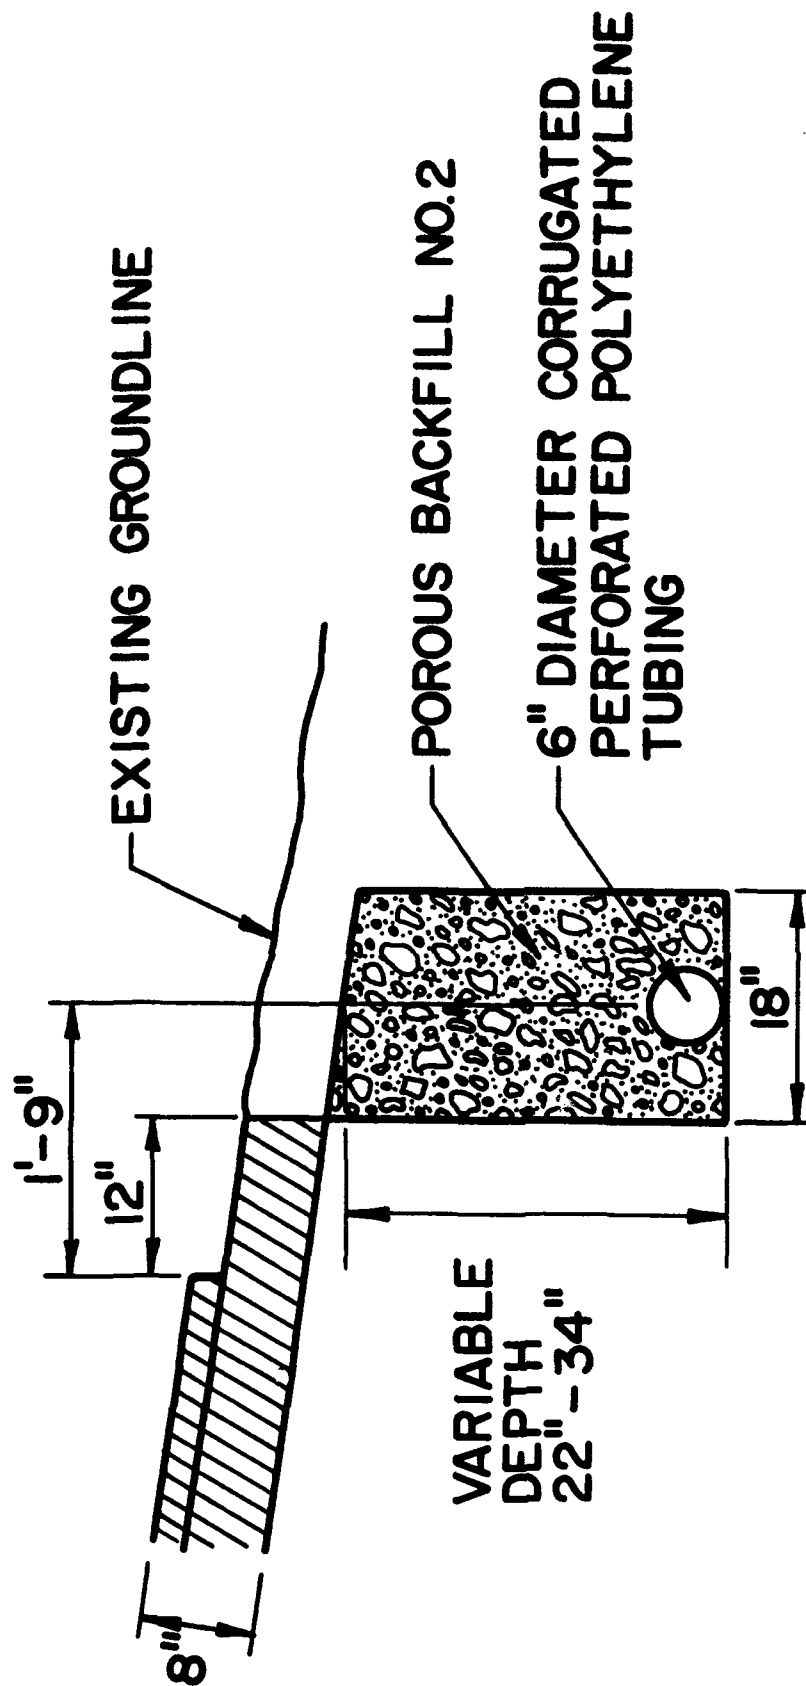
Installation Details for 6 in. Diameter Corrugated Perforated Polyethylene Tubing at the Edge of Runway 09-27.
